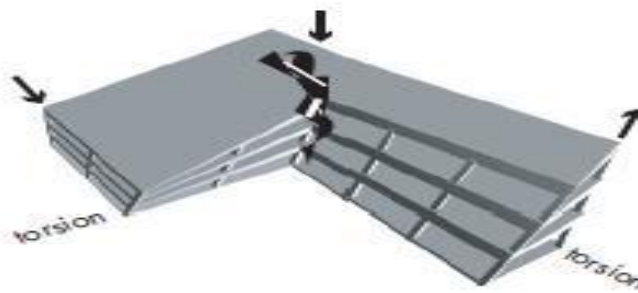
Damage at re-entrant corner in L-shaped buildings
